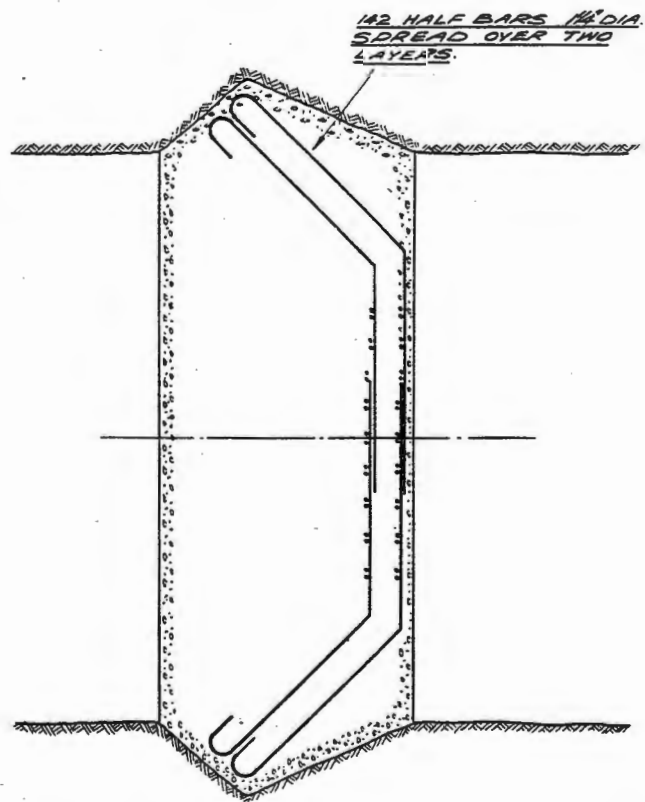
Steel reinforcement in a semi-arch concrete plug⁽¹⁰⁾
